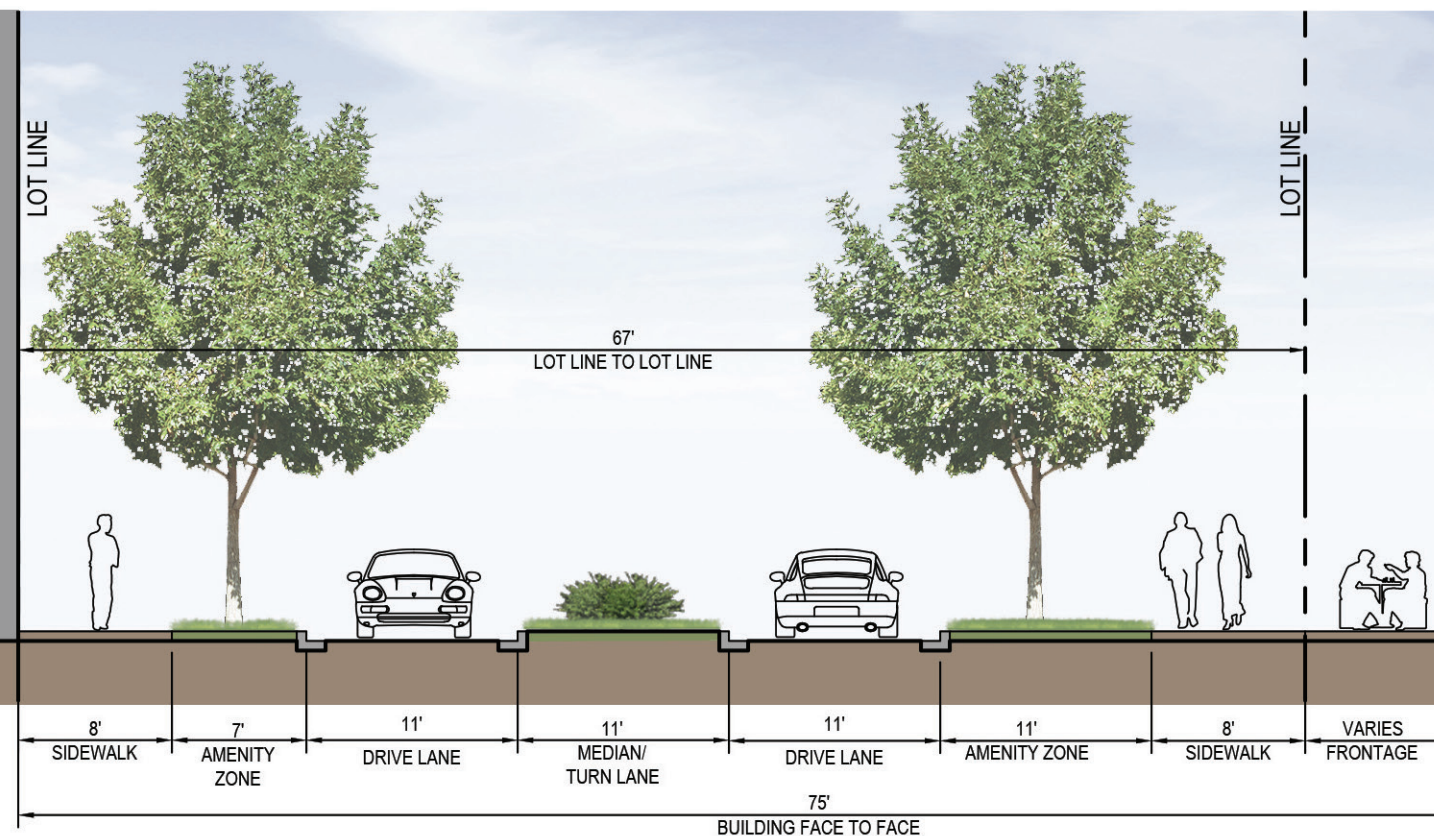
A - PROPOSED STREET SECTIONS - INTERIOR
